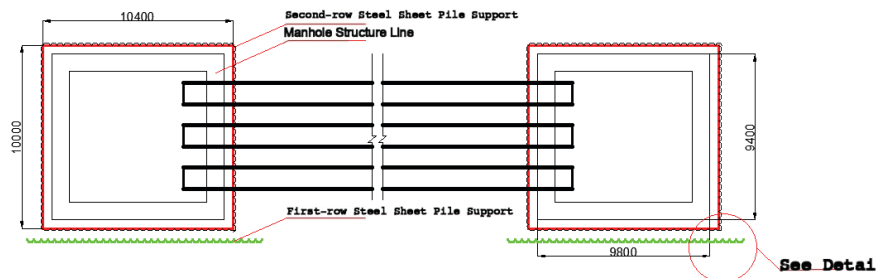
Plan view of the inspection well support at the bridge abutment of the bridge.
